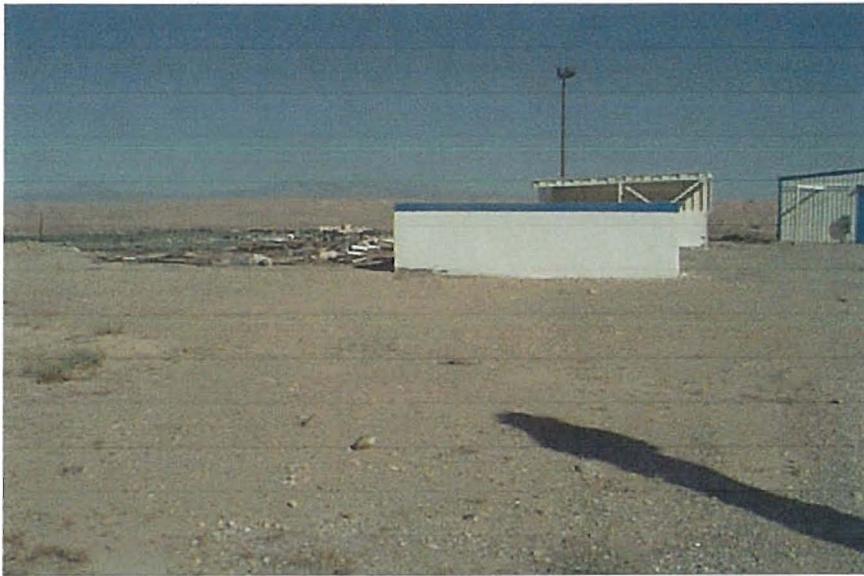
Taken by J. Mur on 8/12/99. Shows disturbance on southwest portion of the Mill Site No. 1 claim.
